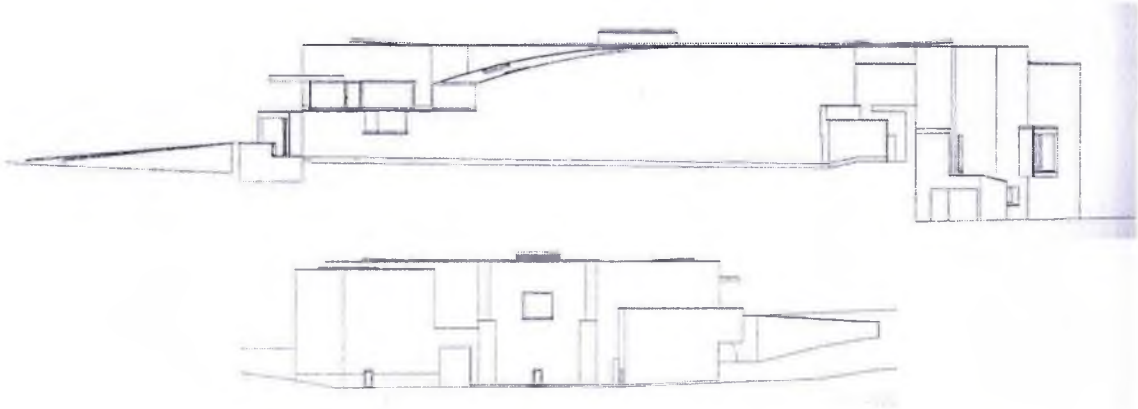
East and west elevations showing the museum embedded in its parkland site
